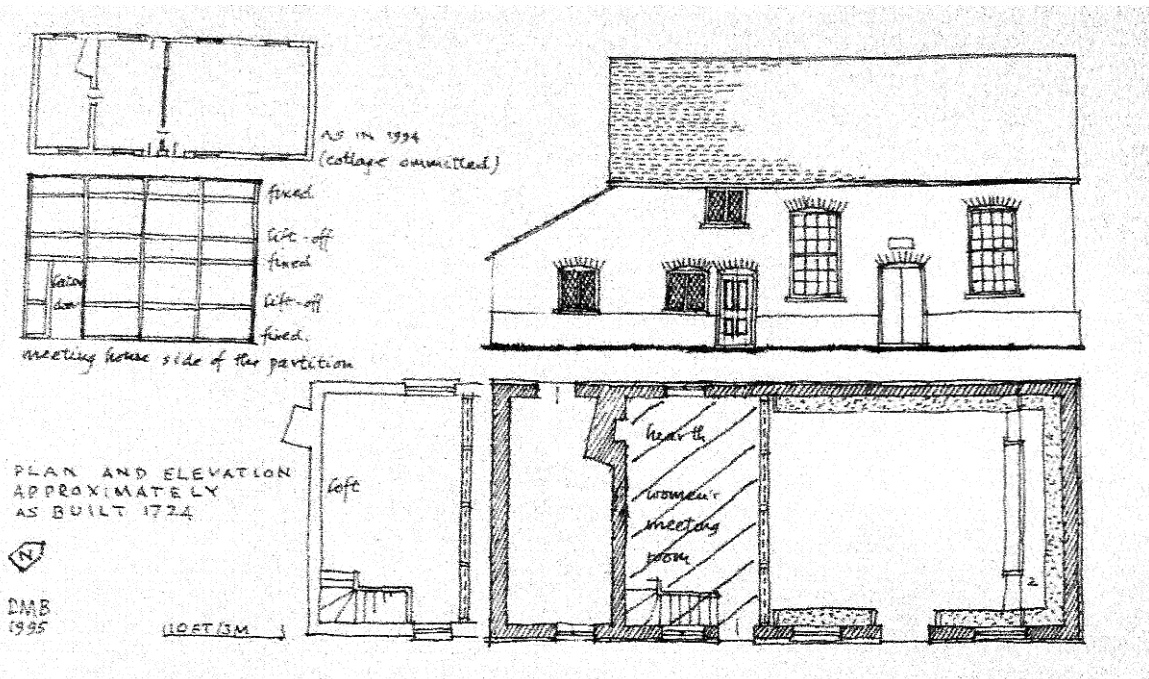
Plan and elevation as built, elevation of the internal partition and plan as in 1994 (southeast is at the bottom; not to scale) (Butler, *The Quaker Meeting Houses of Britain*, 1999, vol. 2, pp. 583)
